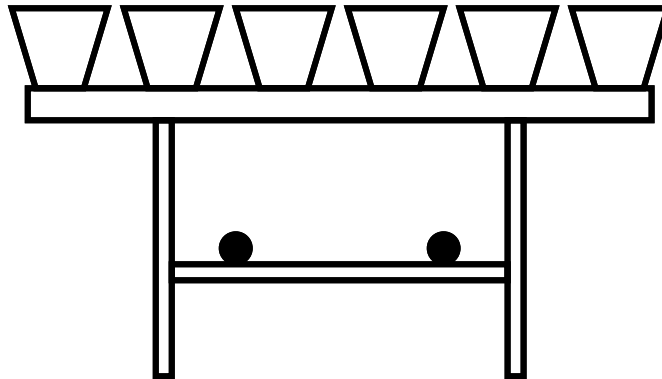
Typical under-bench heating system with steel or extruded aluminum pipe (drawing not to scale).
